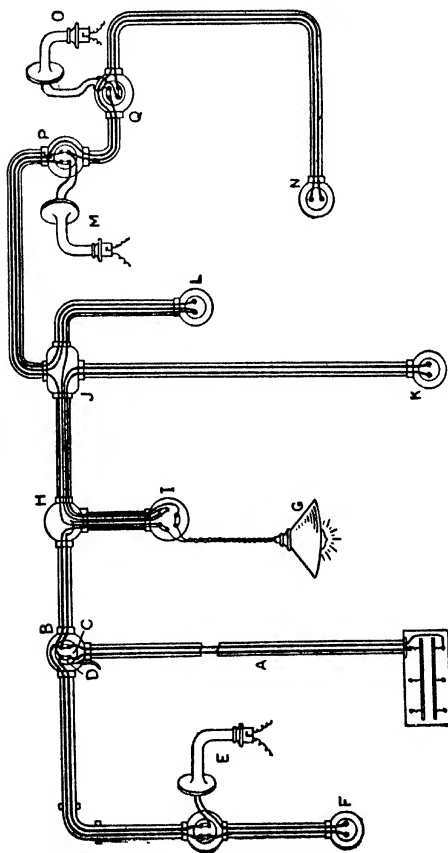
Detailed Wiring Diagram of Top Floor.
